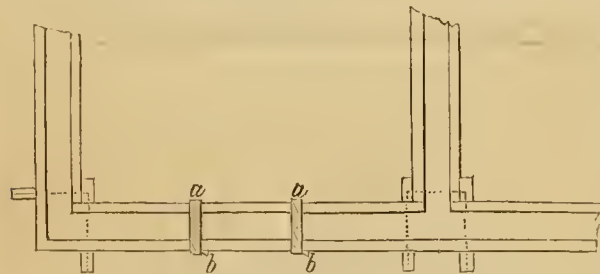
ARRANGEMENT OF THE PLANKS.
